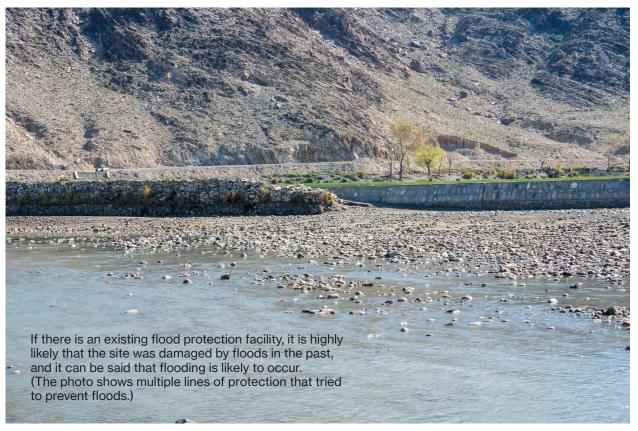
Area Expected to be Flooded Under the Existing Flood Control Facilities¹⁾
